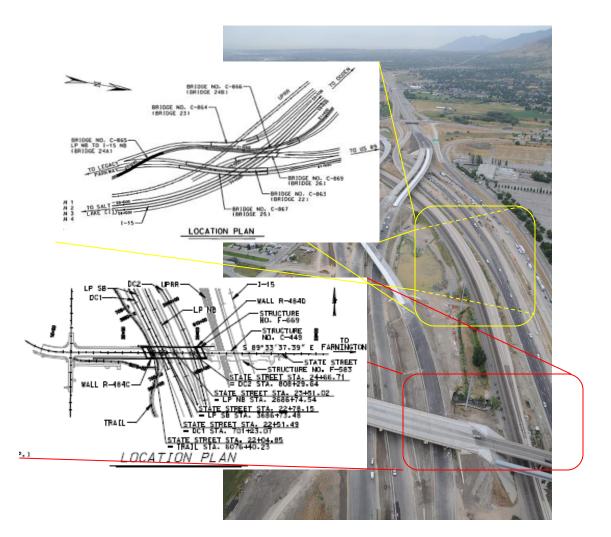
C-865 and F-669 Bridges, Ariel View Figure 9: C-865 Bridge, Plan View Figure 10: F-669 Bridge, Plan View
